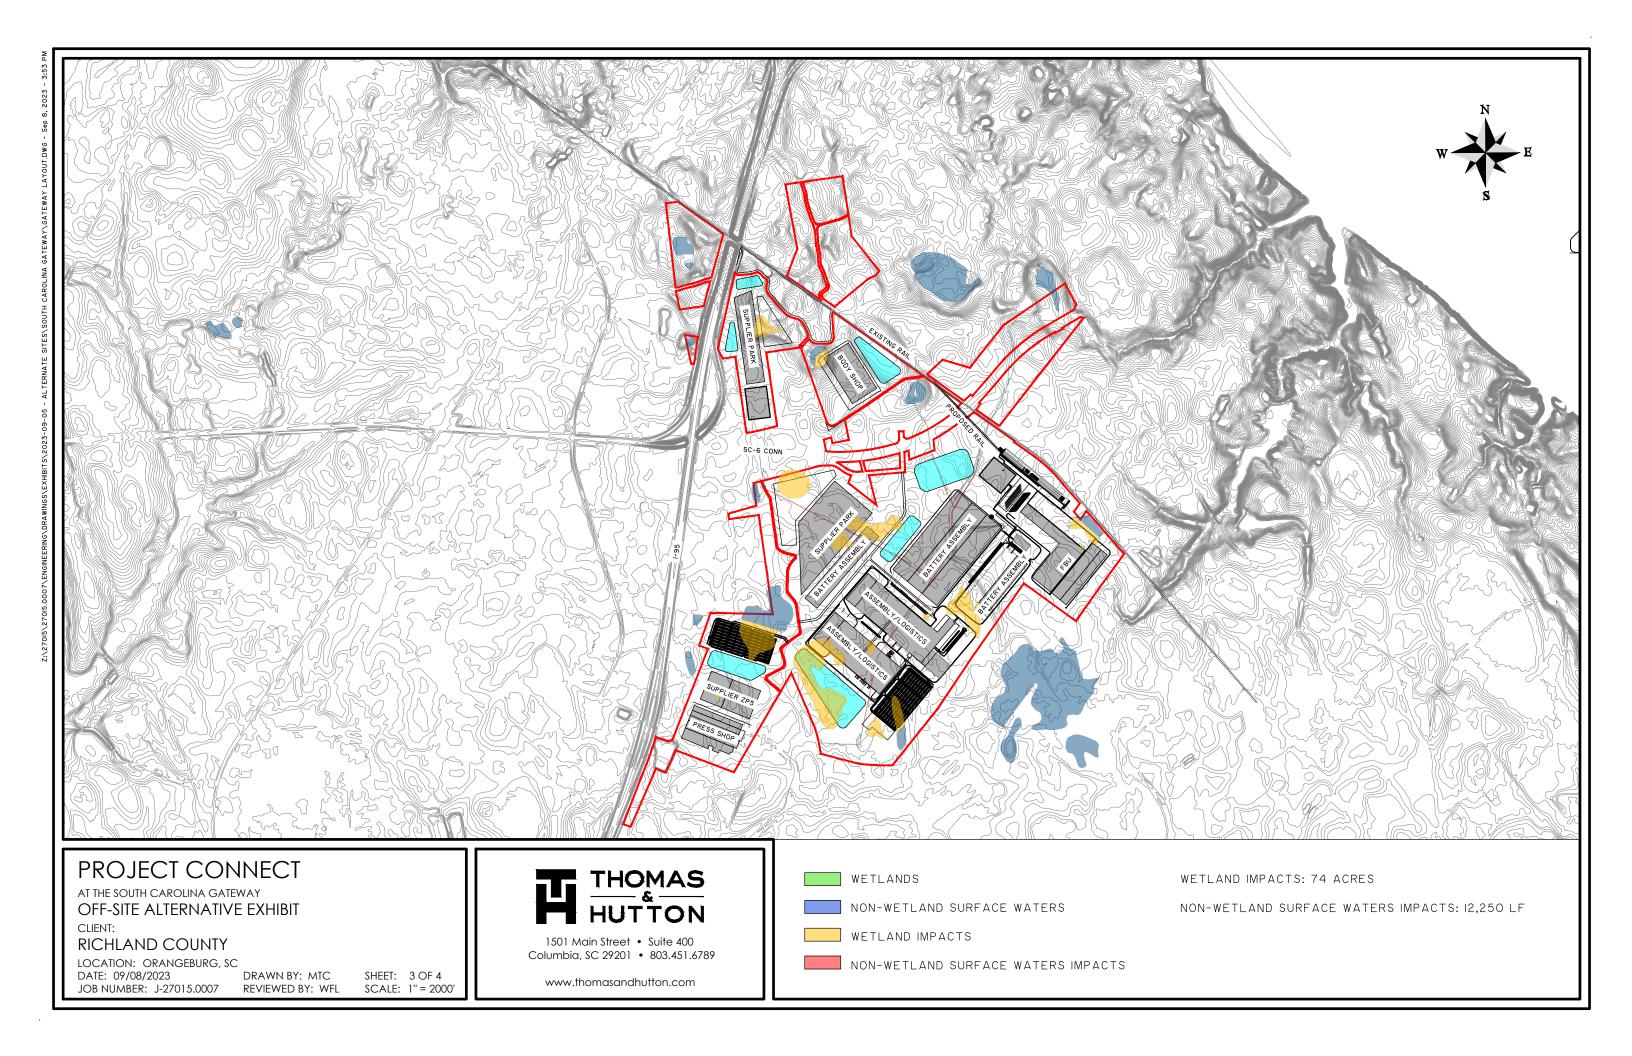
Exhibit O to Project Connect Revised Alternatives Analysis (Site Layout Alternative 2)
